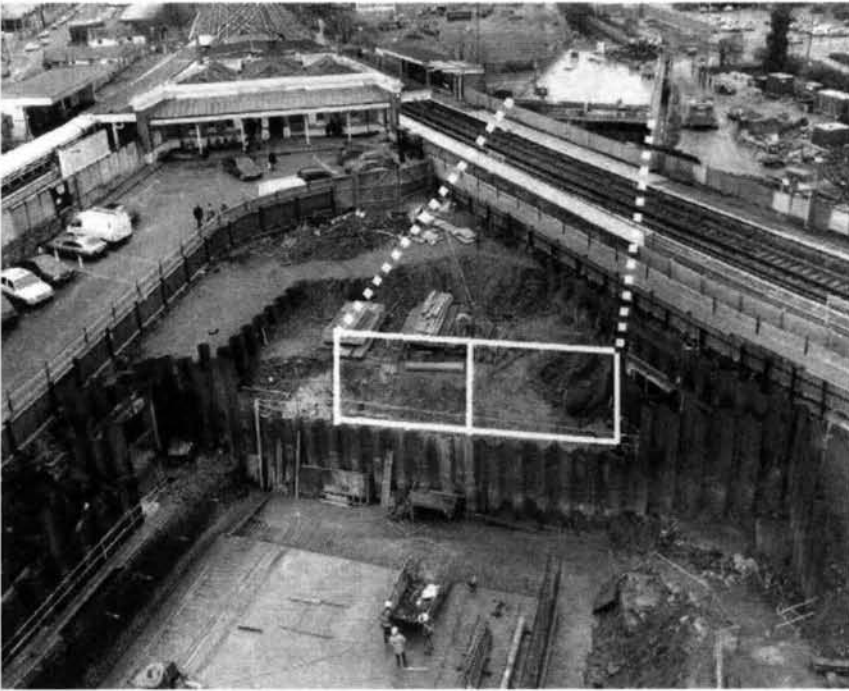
, Rail tunnel alignment and reception area Lewisham Station, London
